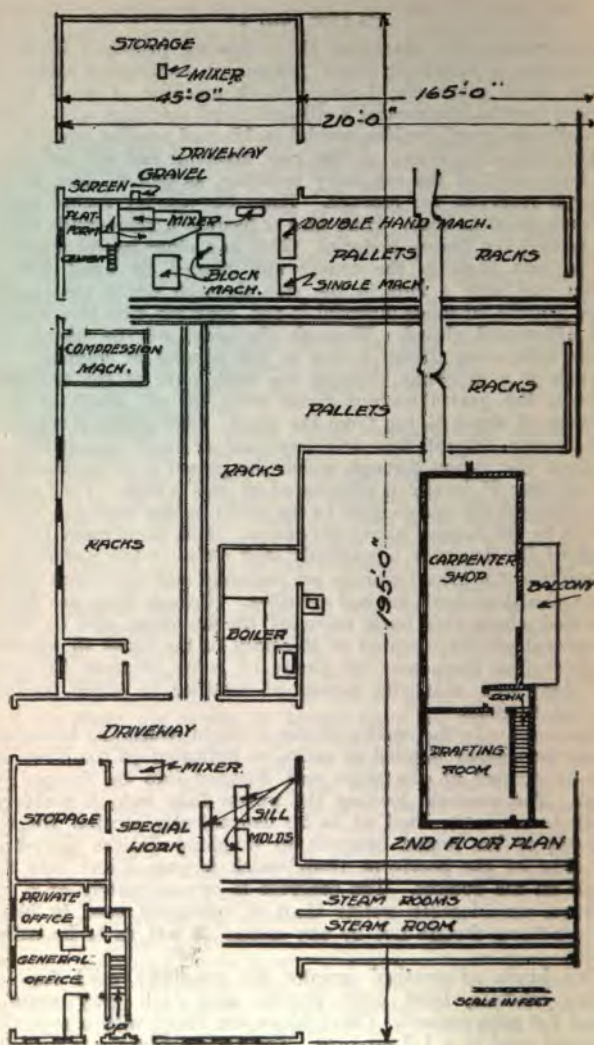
PLANS, FIRST AND SECOND FLOORS, PLANT NO. 7
